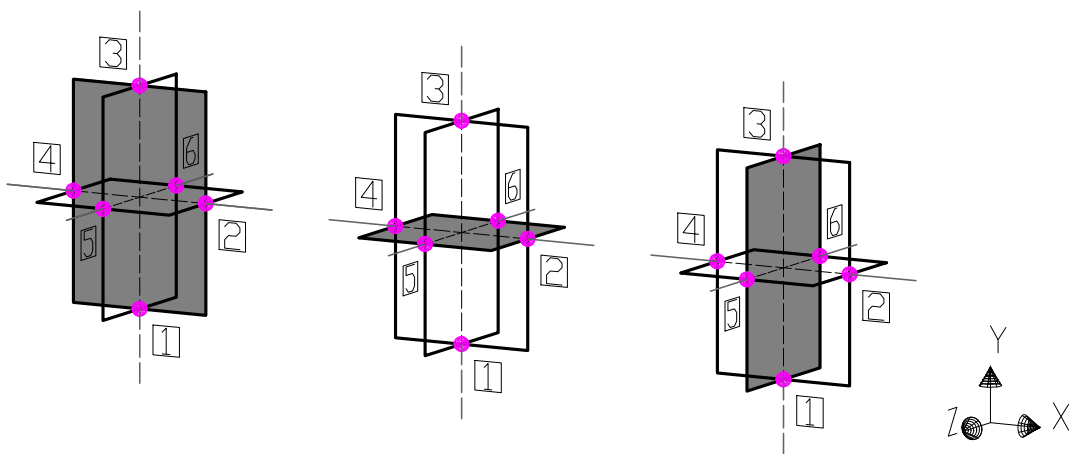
Proposed beam-to-column joint finite element within the INNO3DJOINTS project [5]: Inno3DJointND element's dimensions.
